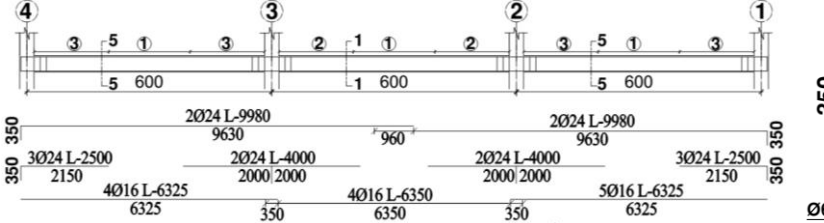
Sample beam detailing for G+2 building with C-25 concrete
